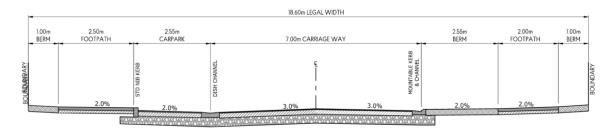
Typical Cross-Section (E) Collector – 18.6m with Berm & Carpark
